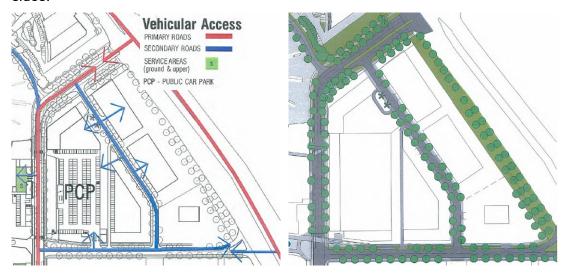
WFCDP extracts Vehicular Access (left) and Master Planning Site Plan (right)
